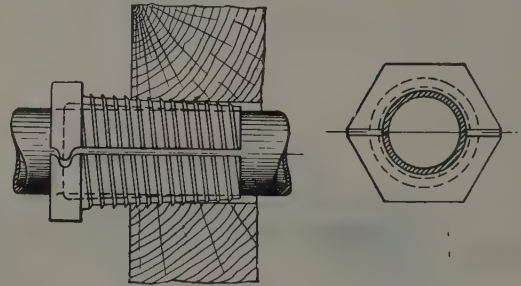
Acme Pipe Clamp for Use in Needle Beam. Western Railway Equipment Company.
